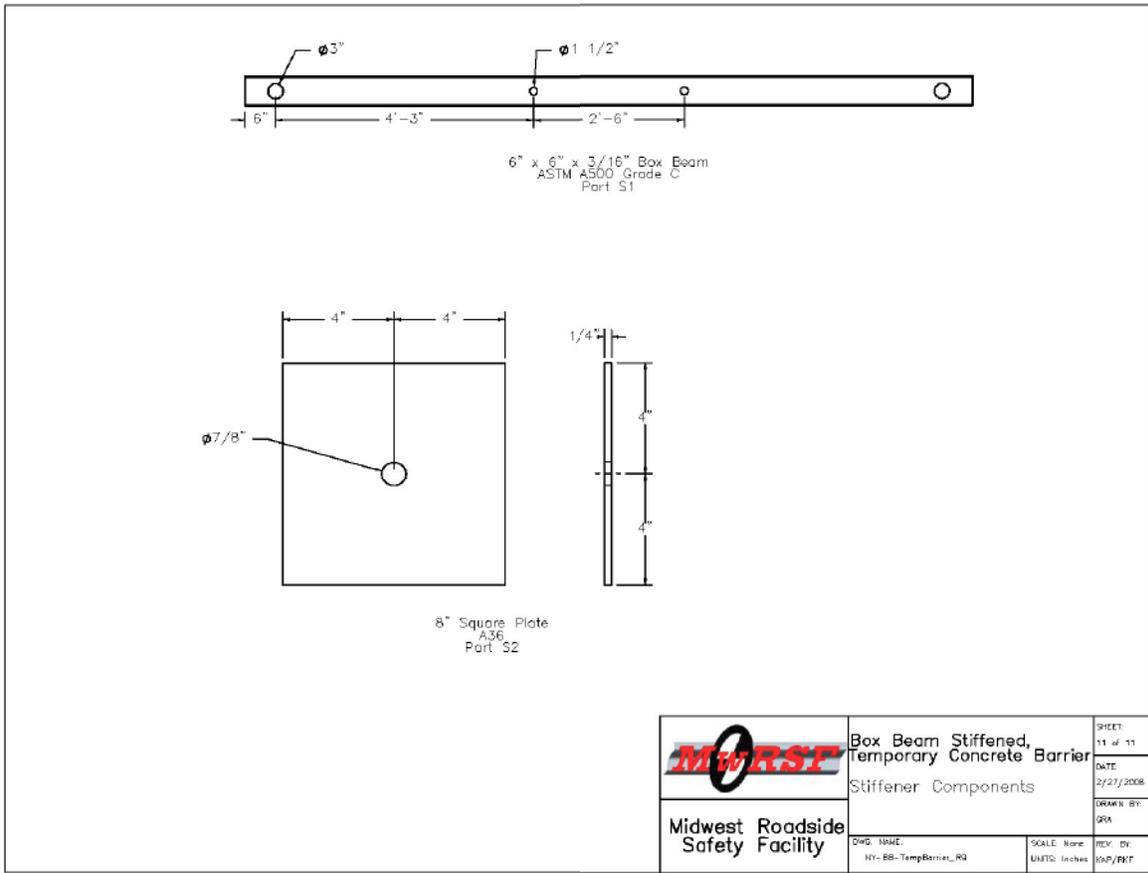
Box Beam Stiffener Details (English), Test NYTCB-1
